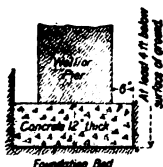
Least dimensions for ordinary concrete footing under brick or rubble wall or pier. Where more bearing area is required on foundation bed the offset and thickness are increased or the sides of the footing sloped, as in Fig. 2.
